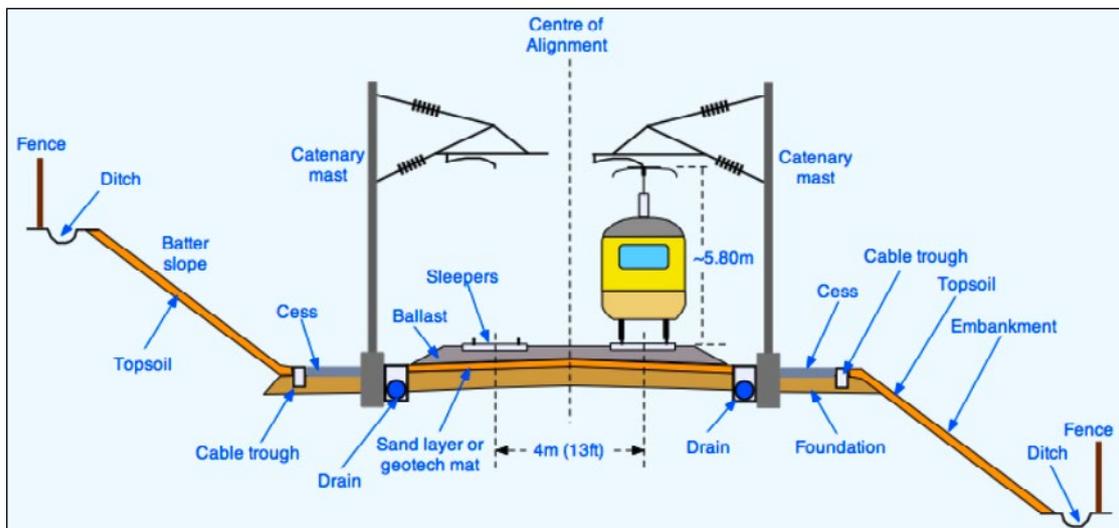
Earthwork (Off-Track) and Track Drainage cross section (after The Railway Technical website <http://www.railway-technical.com/infrastructure/>)
